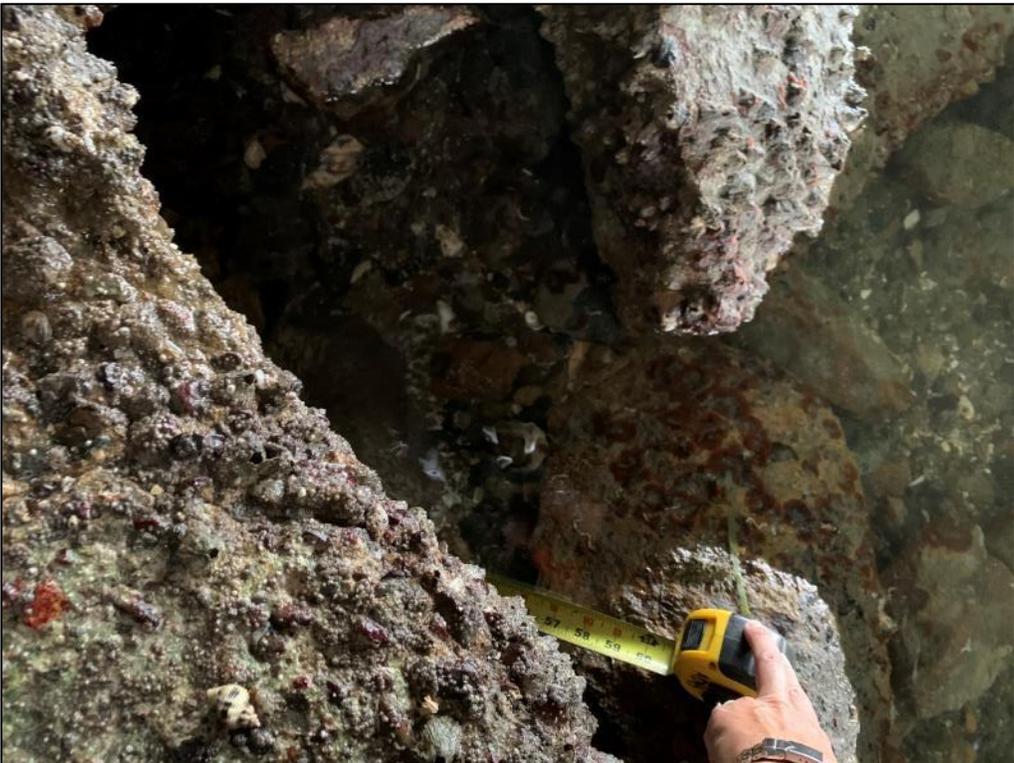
Revetment 3 STA 1+36 A close up showing the void extends 6 ft deep.
